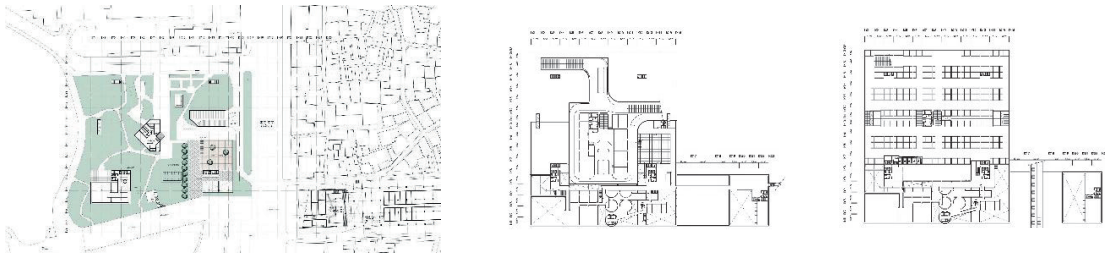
Plans (G.L. Plan, B1 Level Plan, B2 Level Plan)
